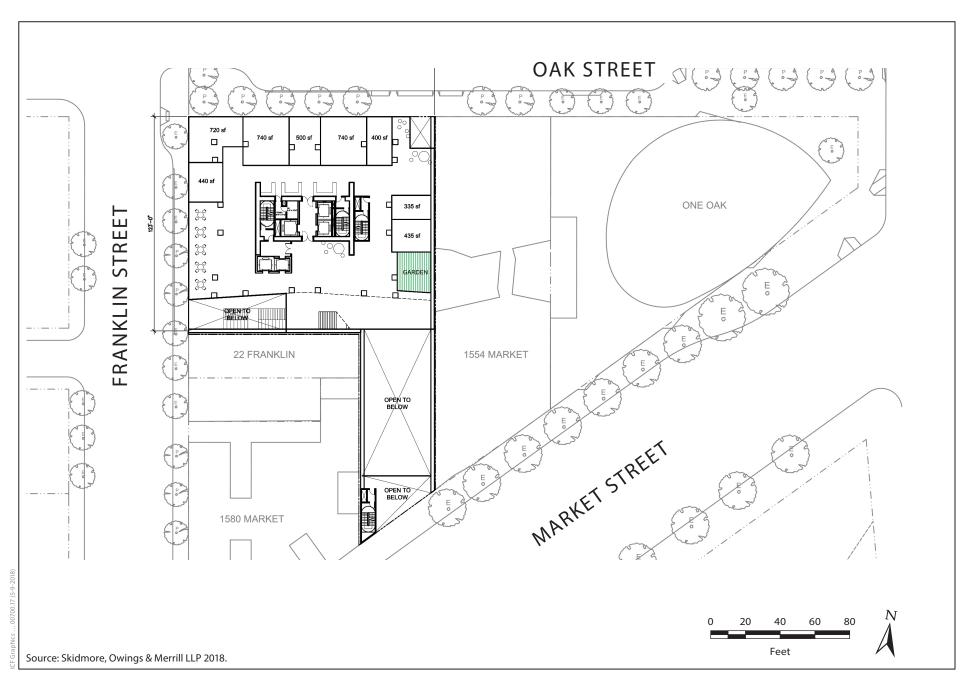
98 Franklin Street Project – Proposed 2nd Level Floor Plan
